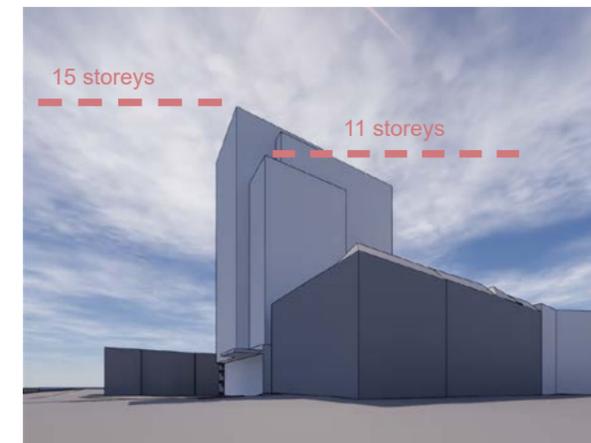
View B from Hunt Museum towards 15 storey building to Bank Place
